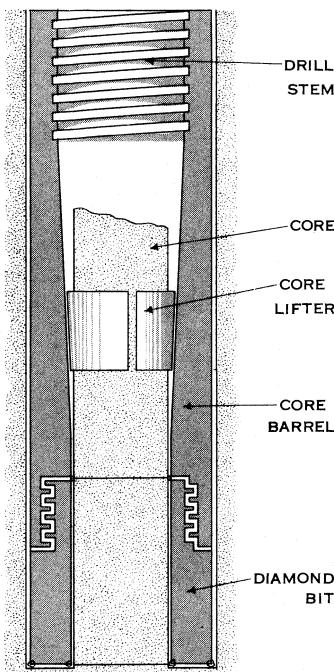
CORE LIFTER USED IN DIAMOND DRILL WORK
